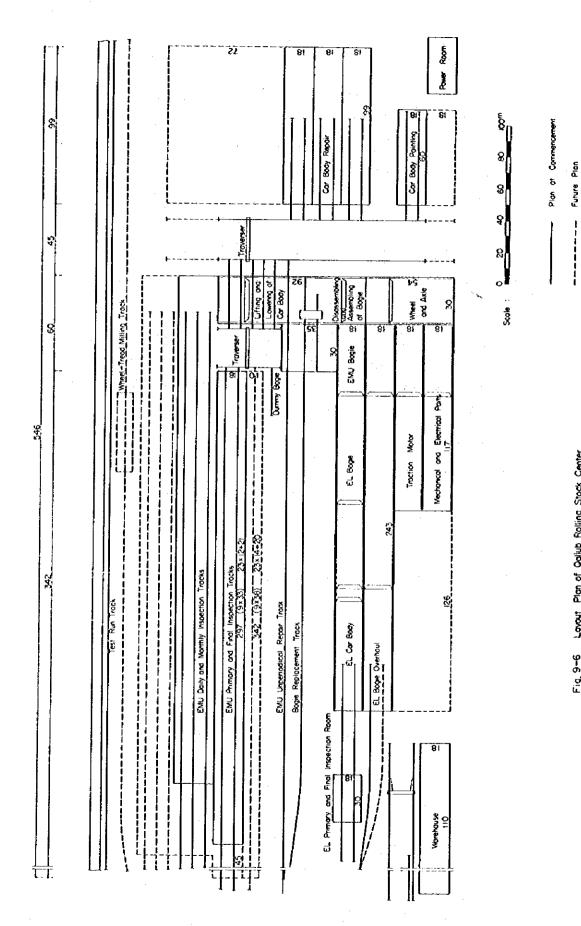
Layout Plan of Galiub Rolling Stock Center
